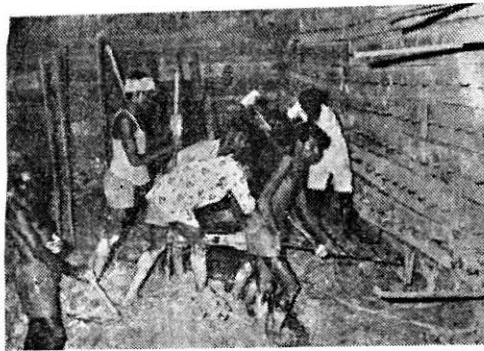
Different stages of horizontal advancing reinforcement through wooden planks as skin elements.
